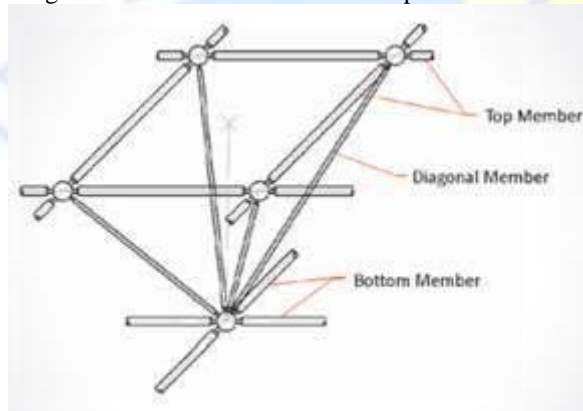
Typical detail of one unit of double layer grid Space Frame element
